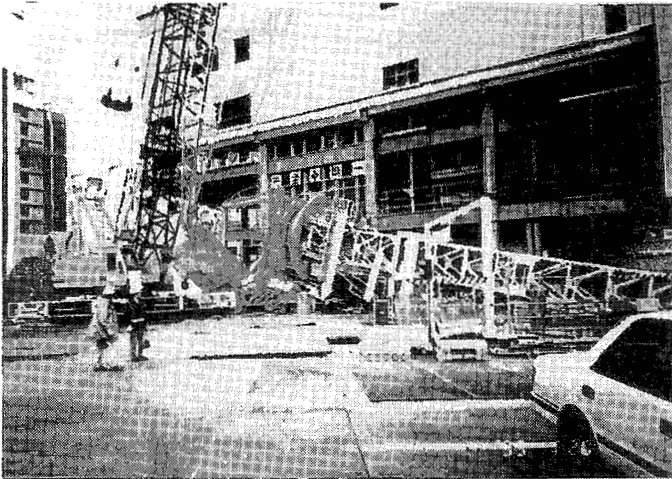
Falling down of a part of tower located above the fixed stay of tower crane.
